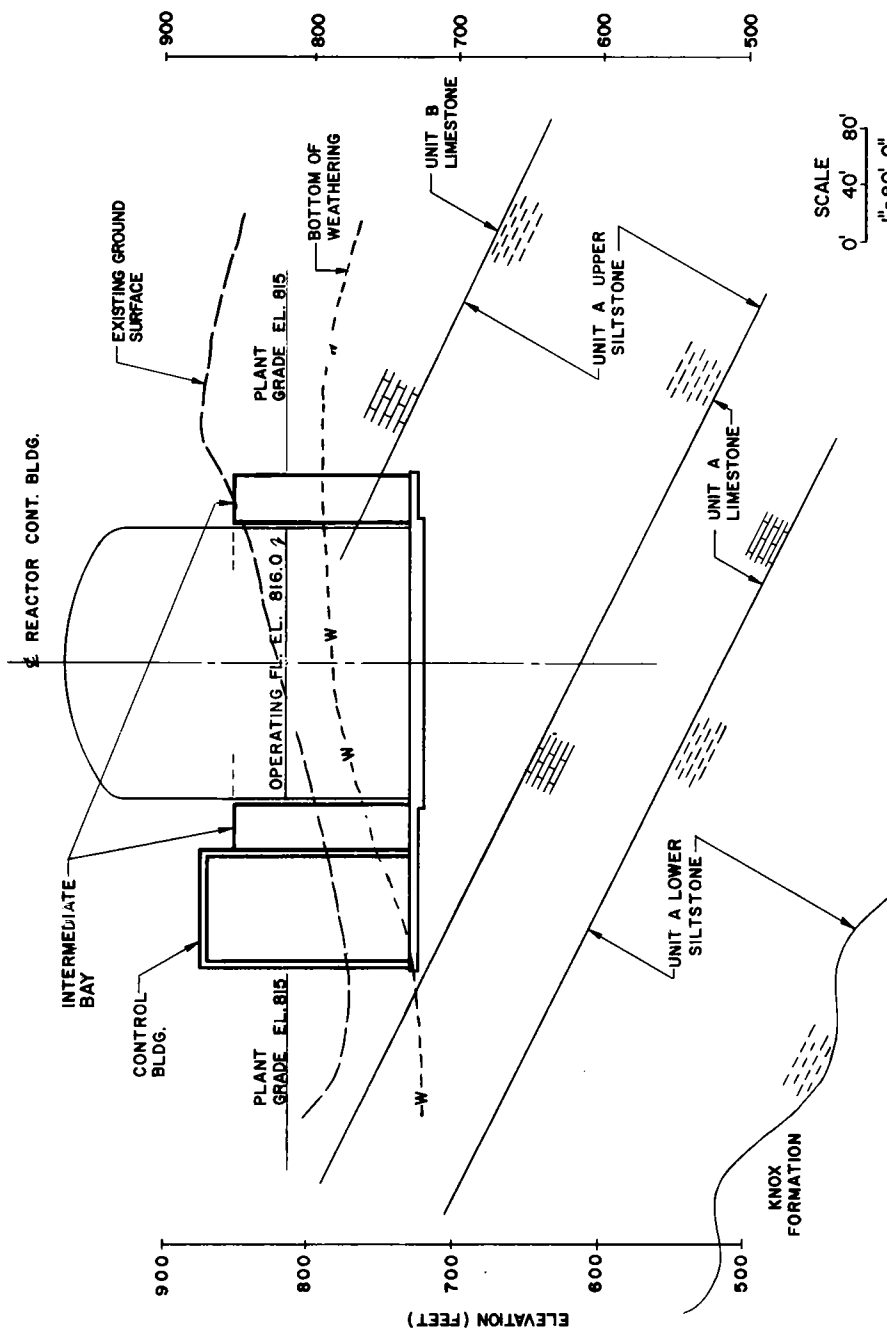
SECTION THROUGH CRBP ISLAND AND FOUNDATION STRATA
